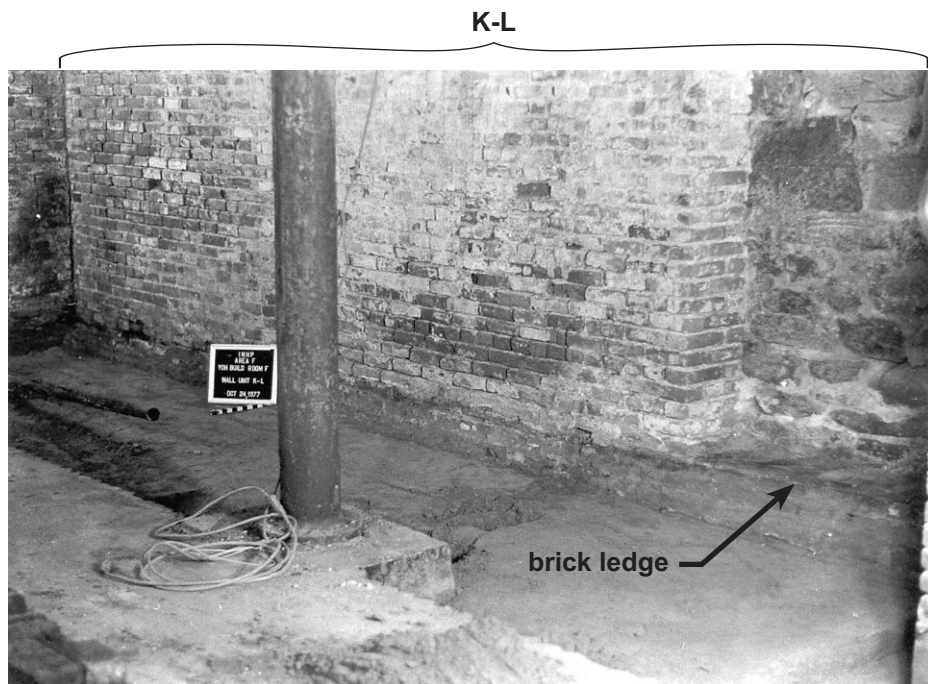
Area F, Yoh Building, Room F, wall unit K-L showing incorporation of c.1896 brick wall with stone cellar wall of an earlier building. Note the brick ledge may have been added to reinforce the earlier stone wall. Trench in foreground; view southwest.
